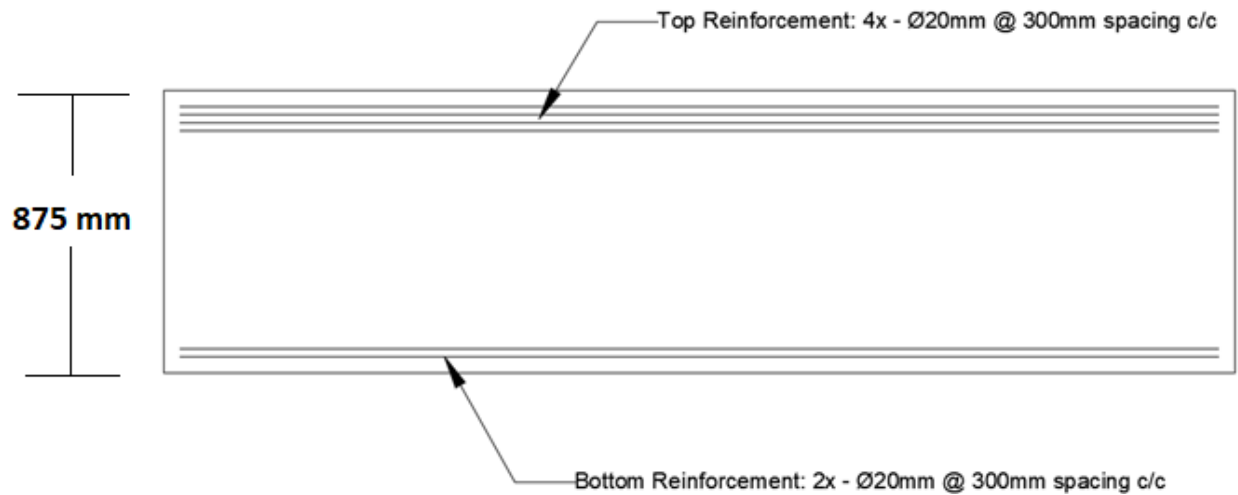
Bending reinforcement layout in roof slab of immersed tube.
